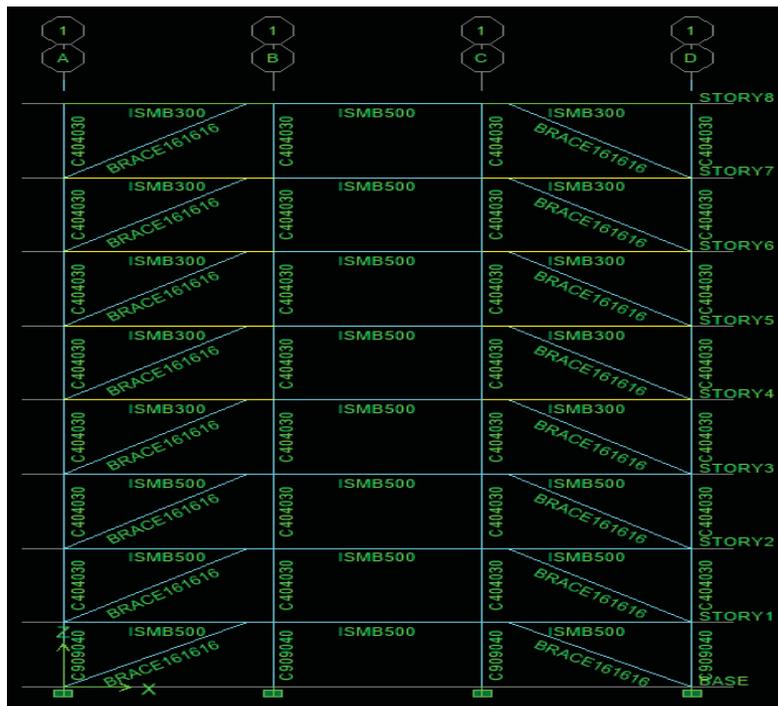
8 story structure with Eccentric Diagonal bracing system
